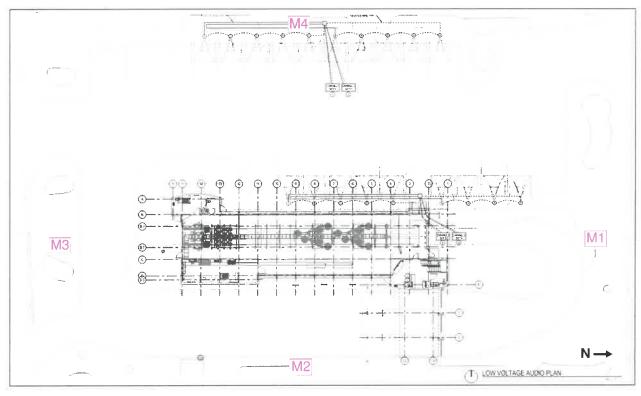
Hudsonville Site Plan with Long-Term Measurement Locations
